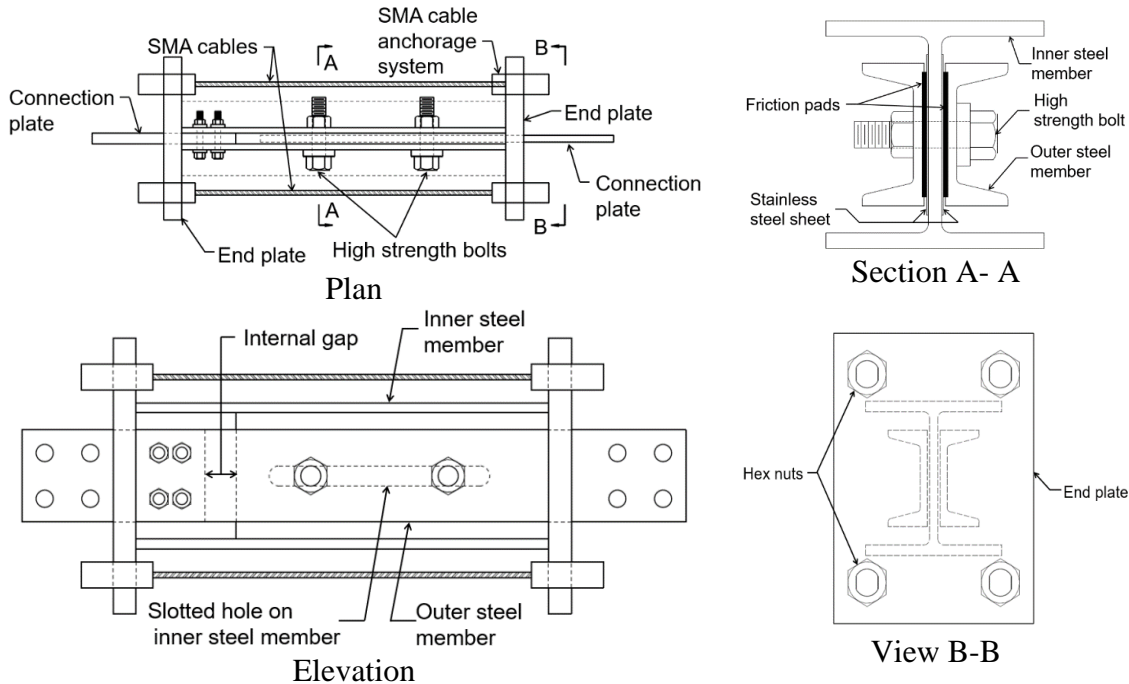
Superelastic friction damper: plan, elevation, and section views
